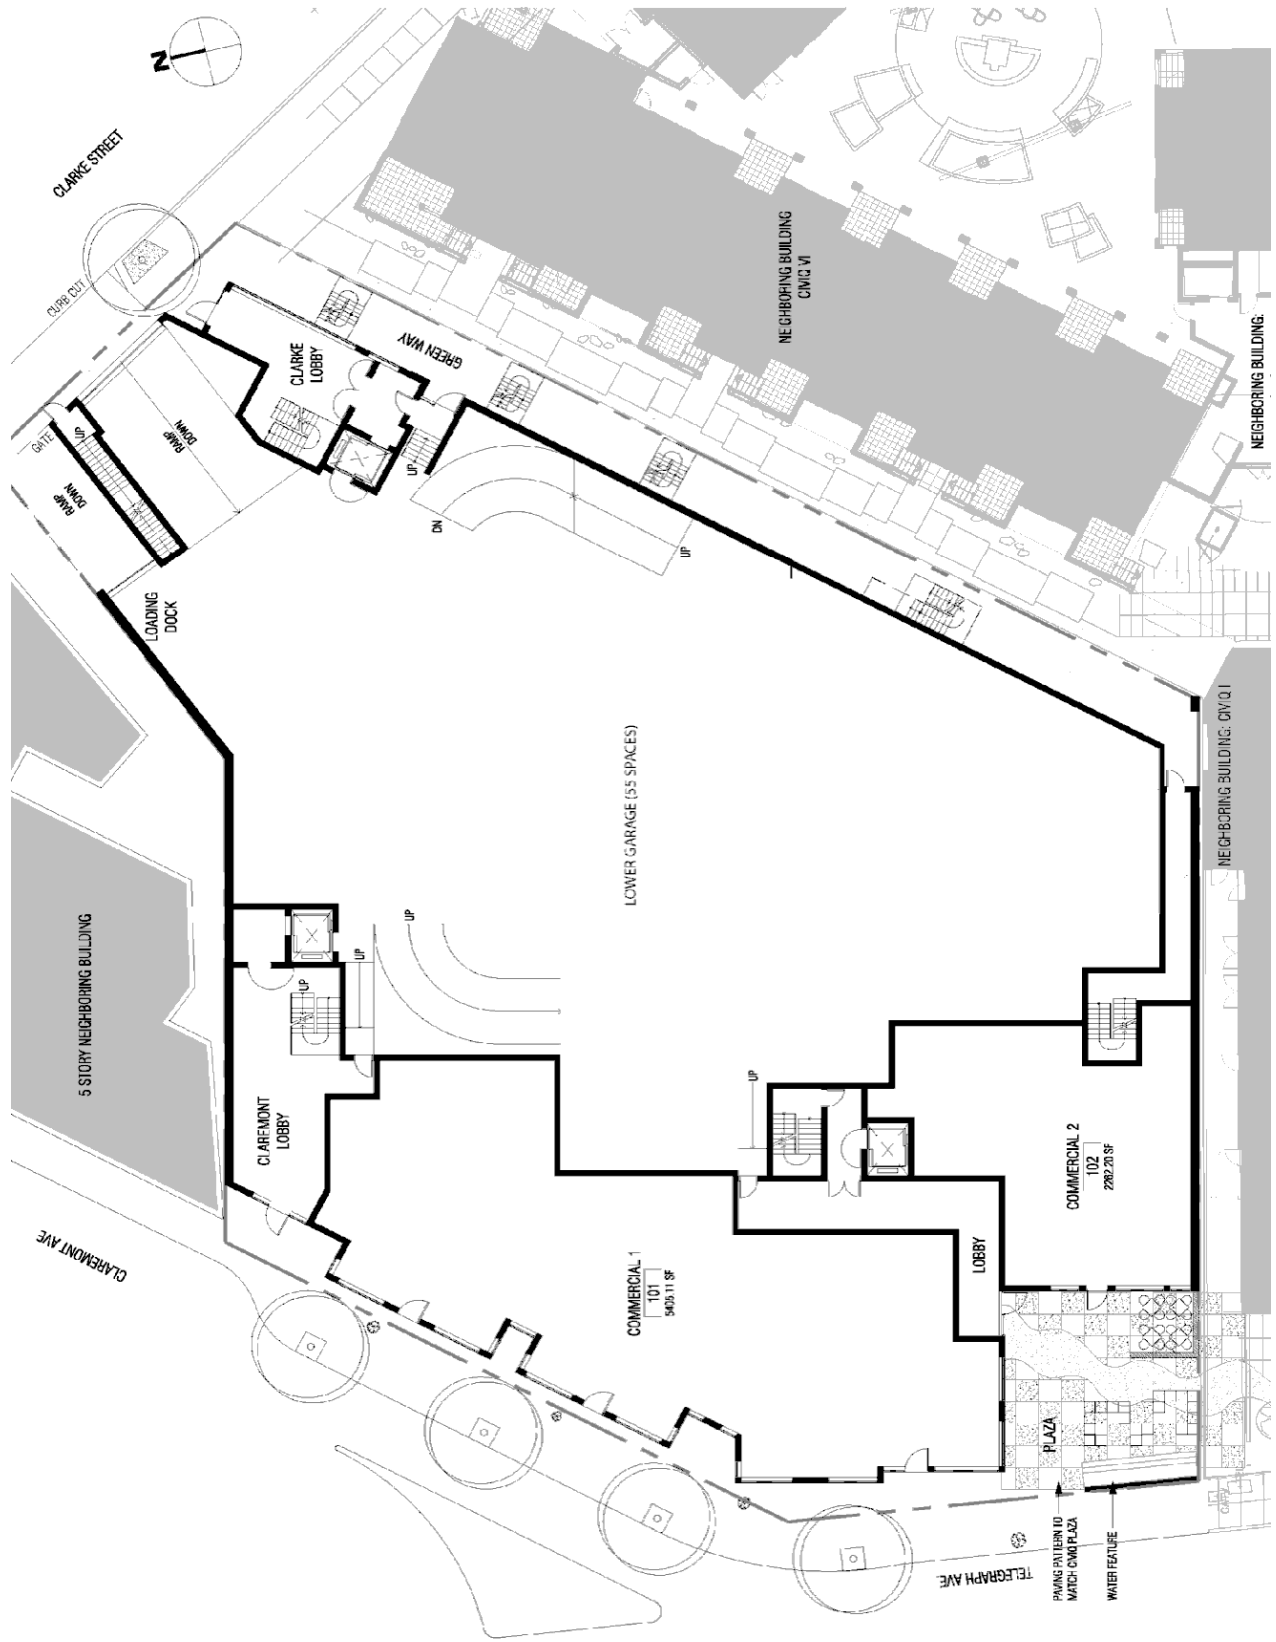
First Level Floor Plan. Source: Hauser Architects.
